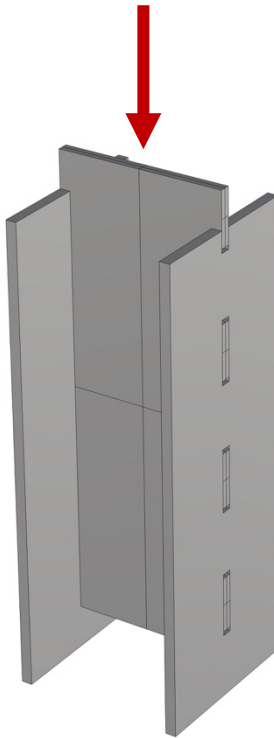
Rhino rendering of 100 mm tenon-mortise joint sample
